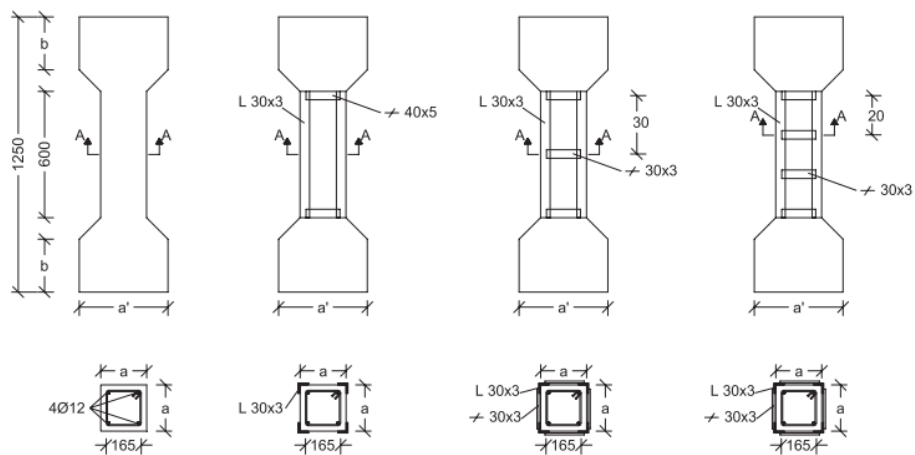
Strengthened specimens with steel angles and steel battens. Campione (2013)
